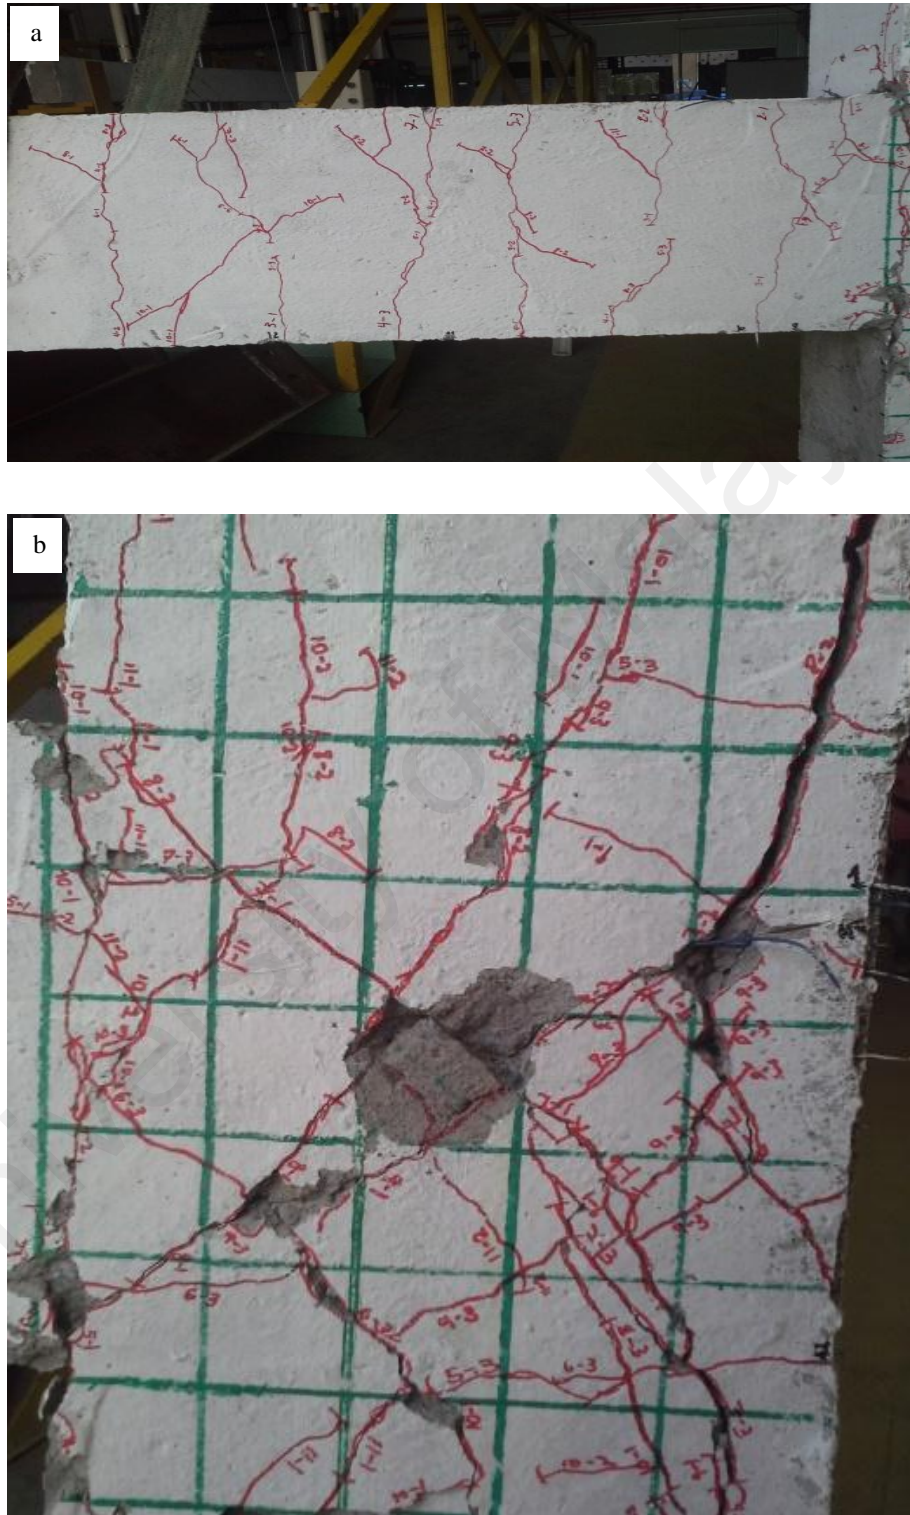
Crack propagation in (a) beam (b) joint zone of the NC<sub>2</sub> beam-column specimen
